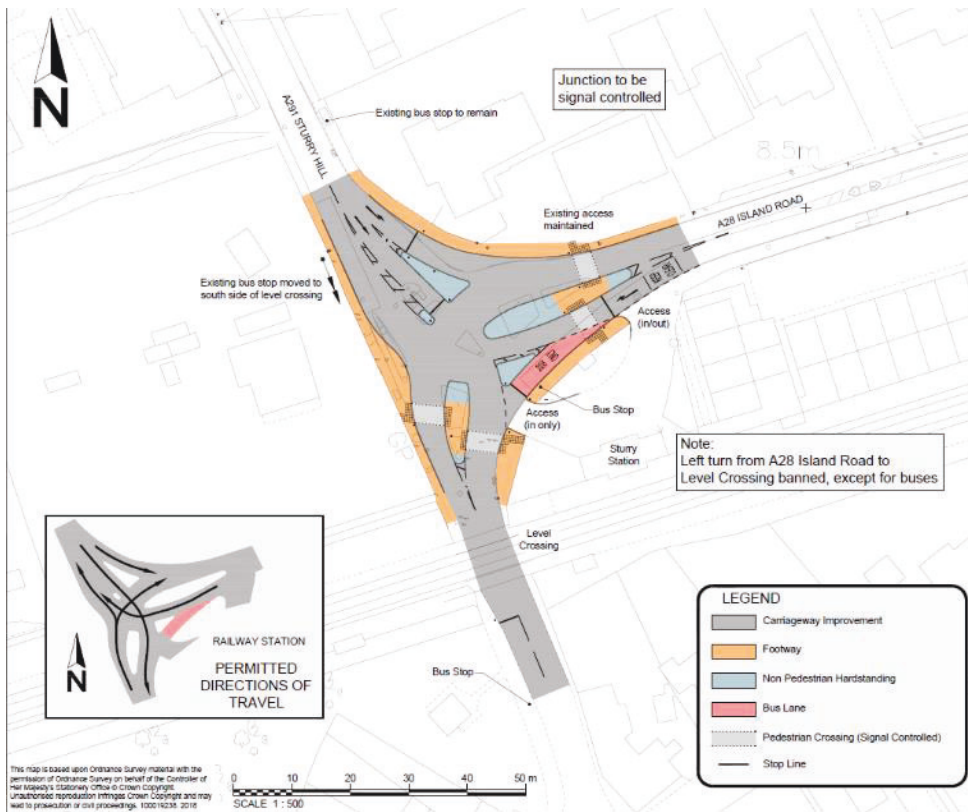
Option 4 for the Proposed Road Layout North of Sturry Level Crossing
